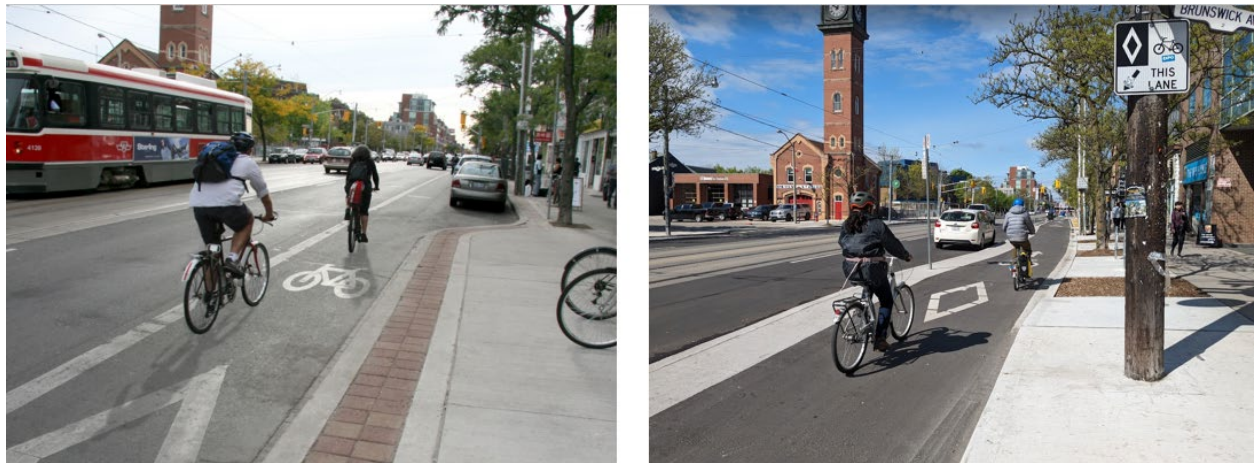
College Street Upgrade – Before (left) and After (right) Photos
